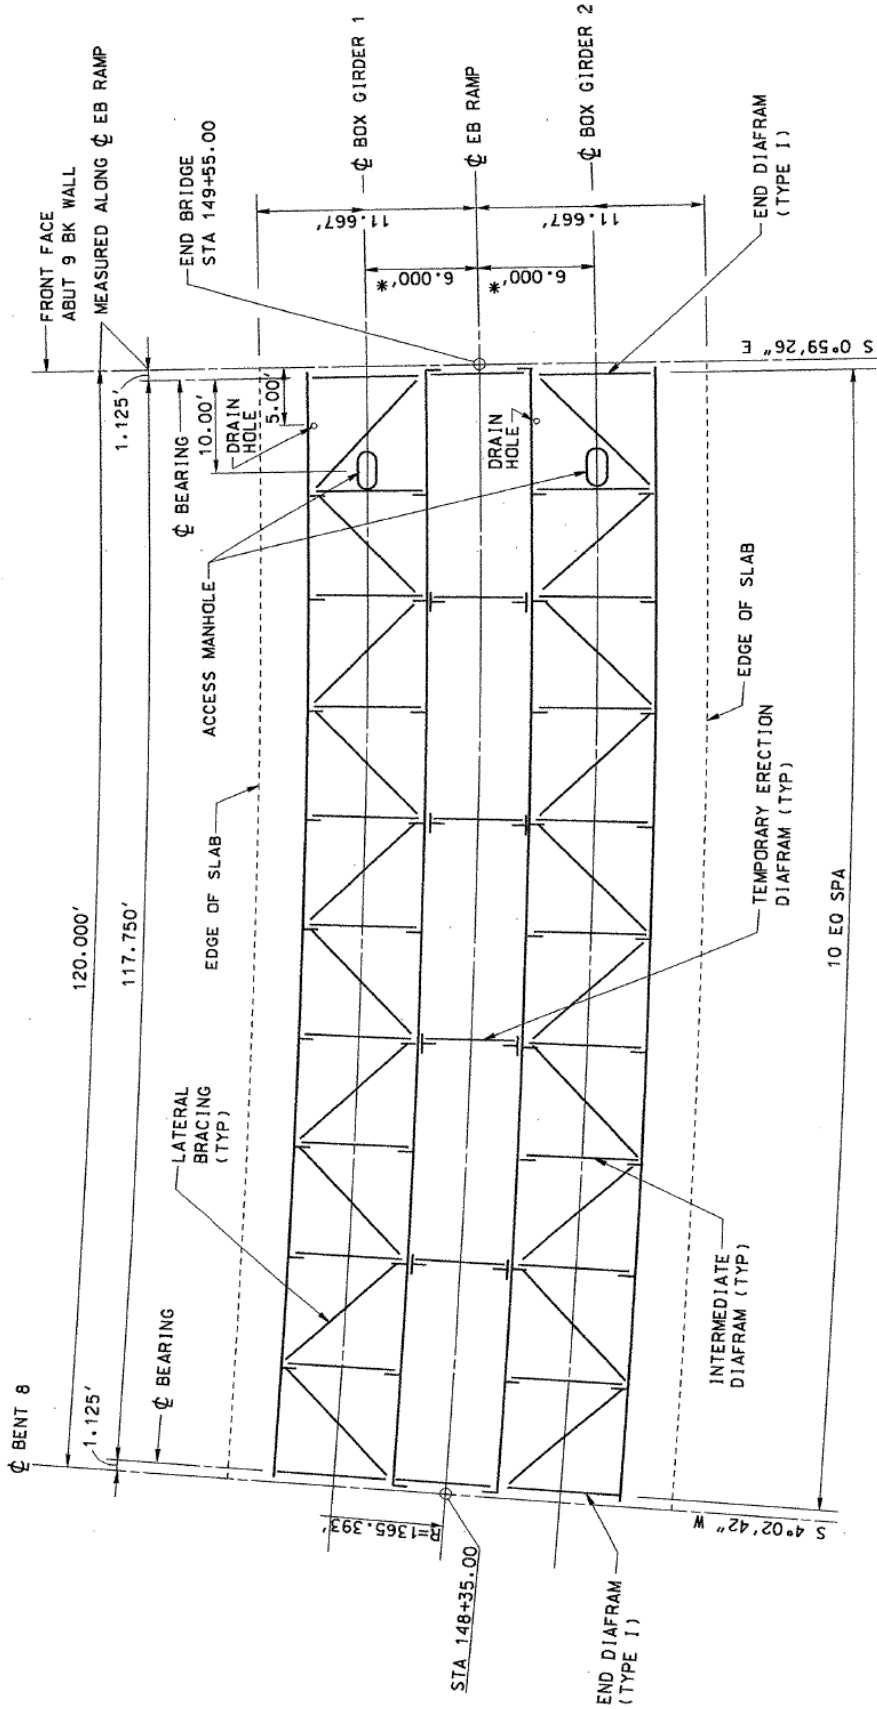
Plan View of Tub Girder and Framing Plan (TxDOT 1996).
